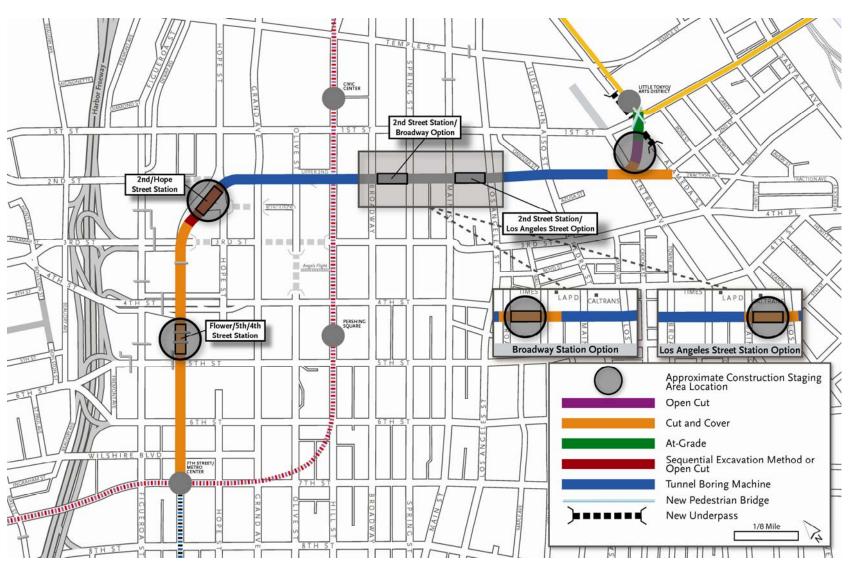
B Construction Methods (Underground Emphasis LRT Alternative)
